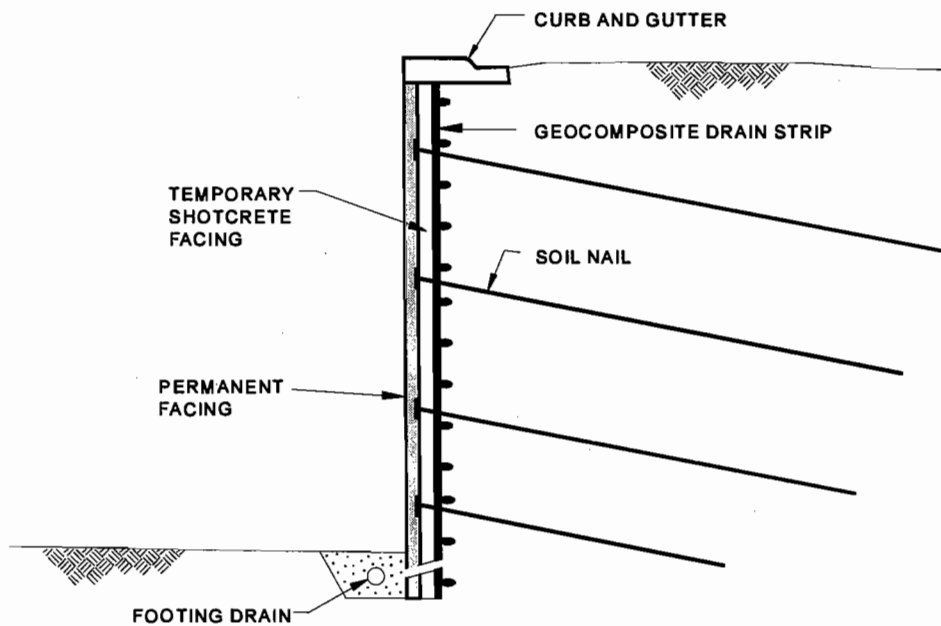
Drainage system for soil-nailed wall (modified after FHWA-SA-93-068, 1994).
